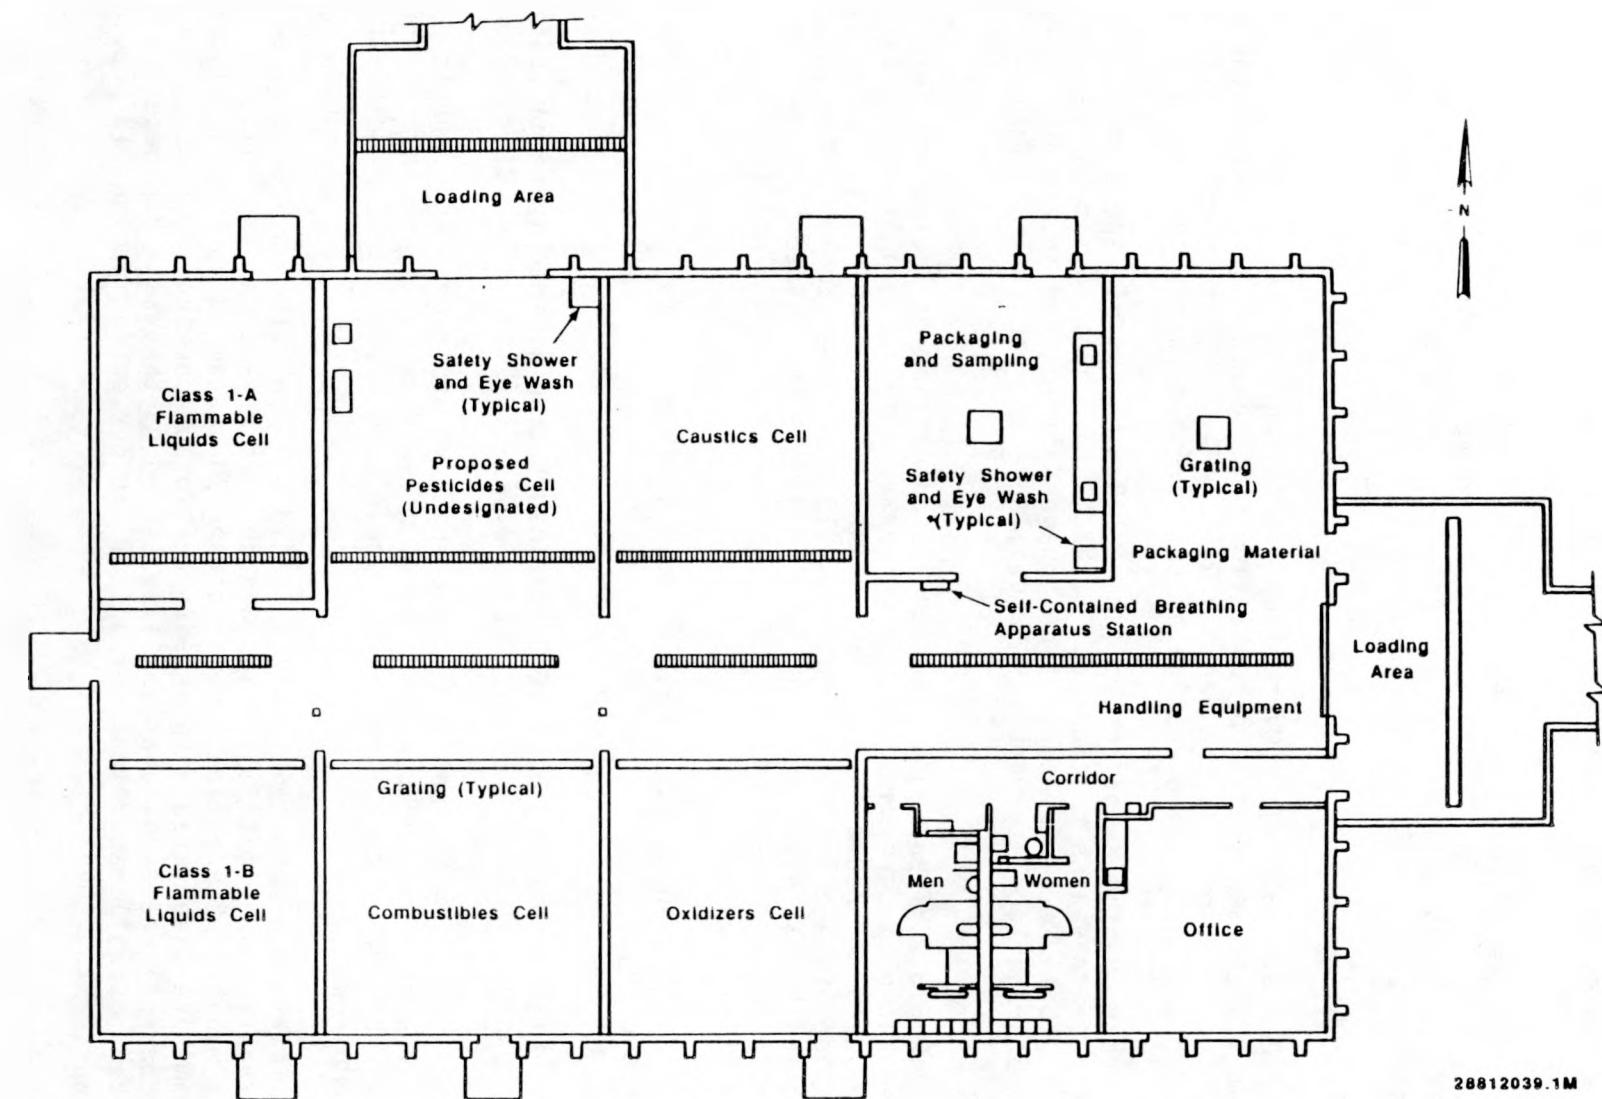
Nonradioactive Dangerous Waste Storage Facility Floor Plan.
